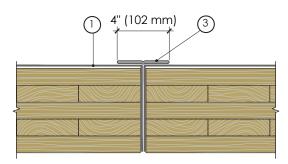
Erection of CLT roof panels with pre-applied membrane.
